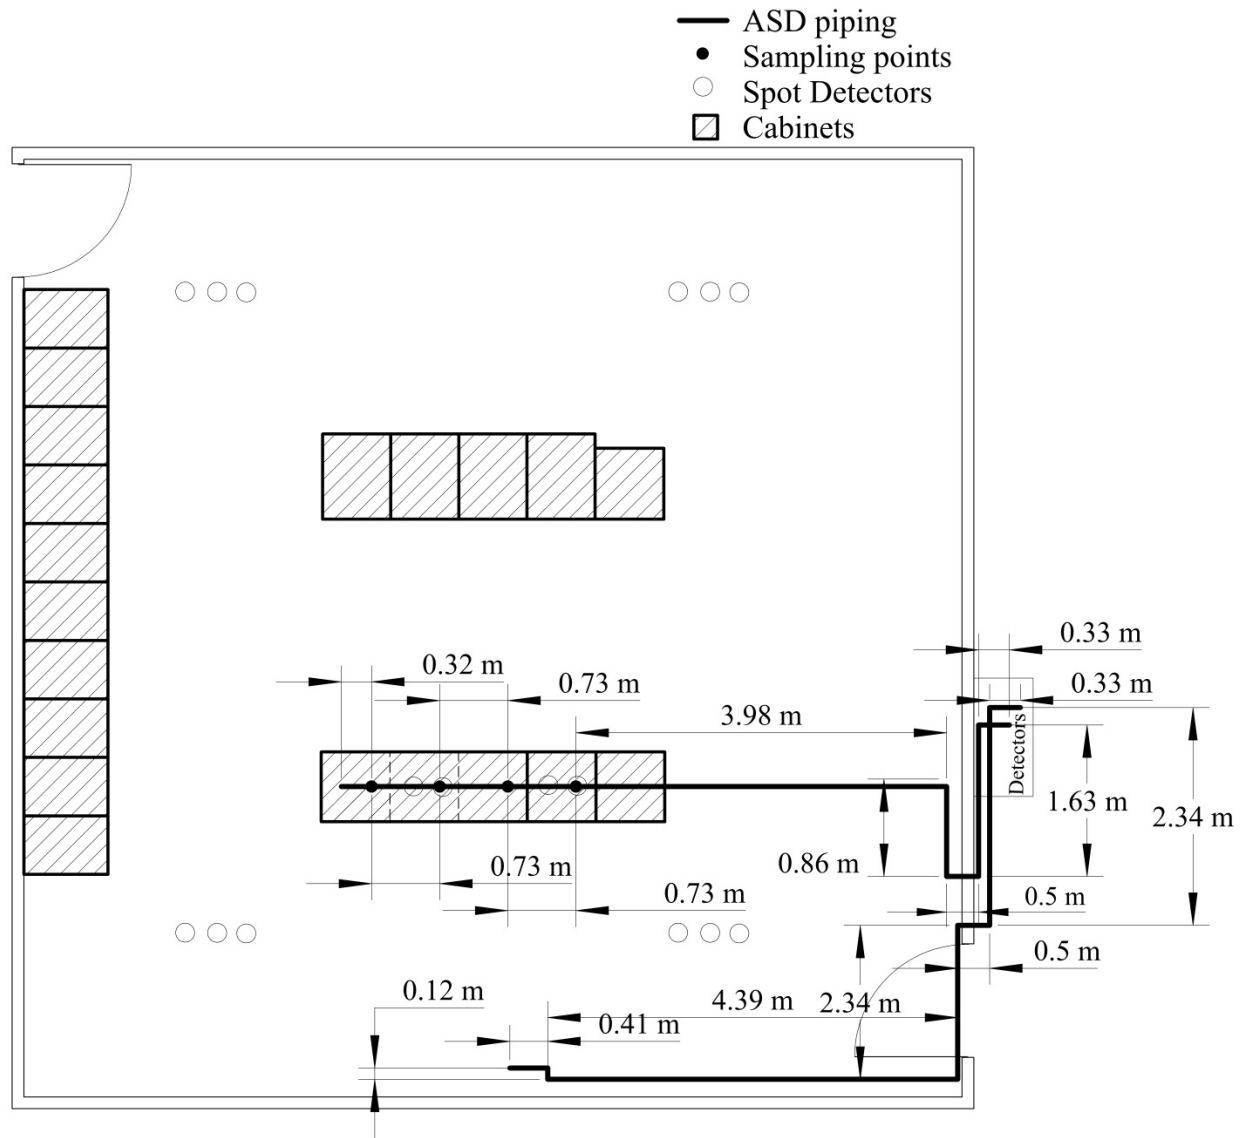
ASD4 piping layout for the in-cabinet and HVAC inlet sampling
